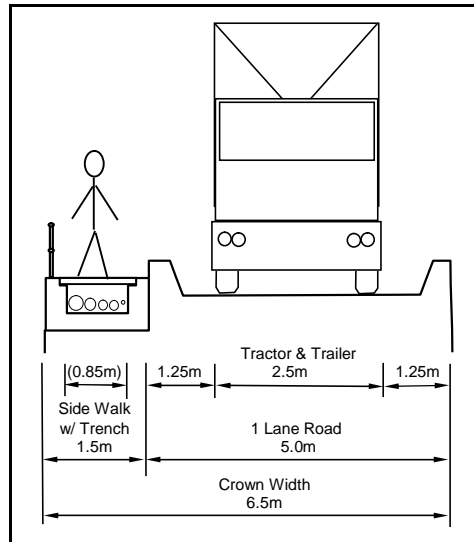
Traffic Condition of Access Trestle (1 Lane)
